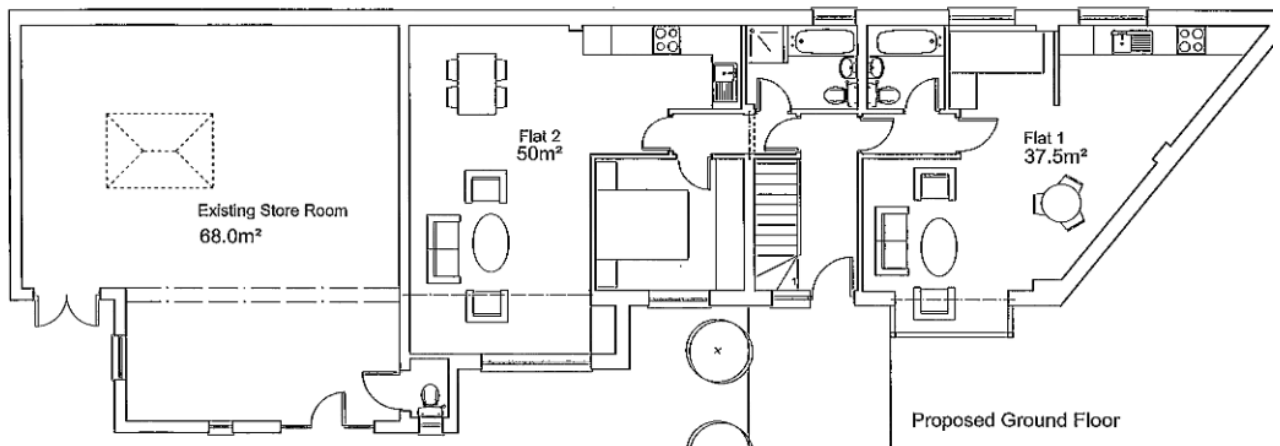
Refused proposed ground floor plan for planning application 15/01385/FUL.
